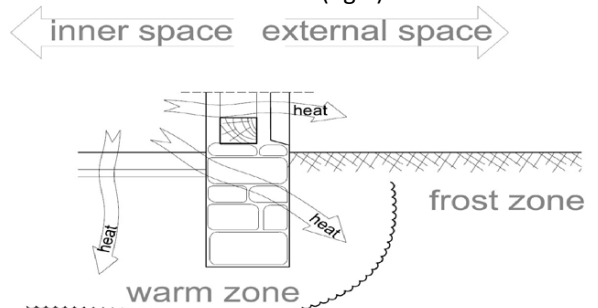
Diagram of the existing foundation – original layout from the 19th century, source: author
